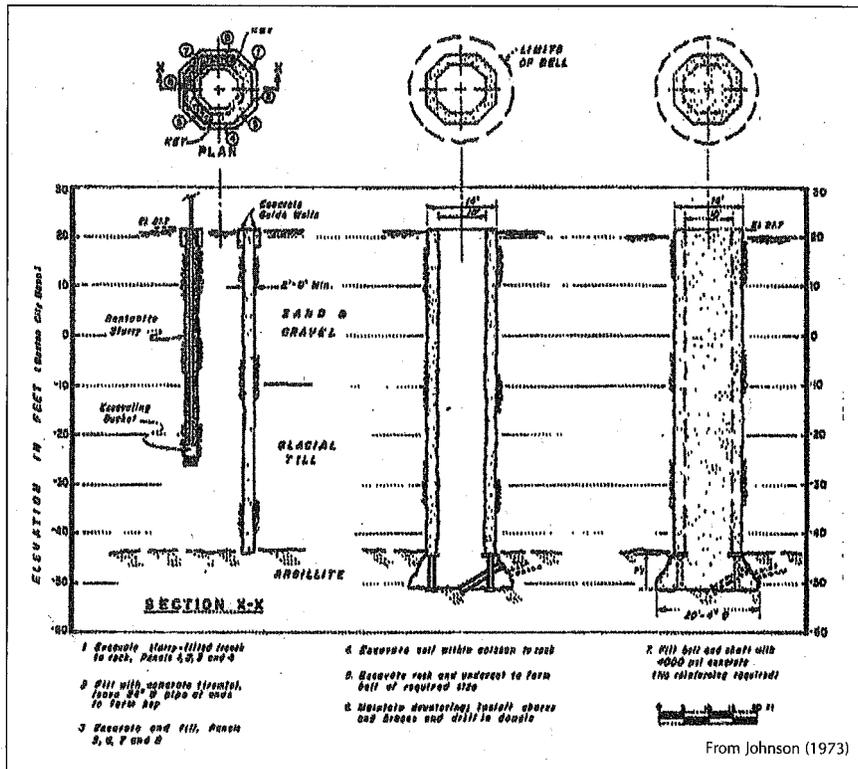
Construction procedures for corner piers for the Boston Company Building.
